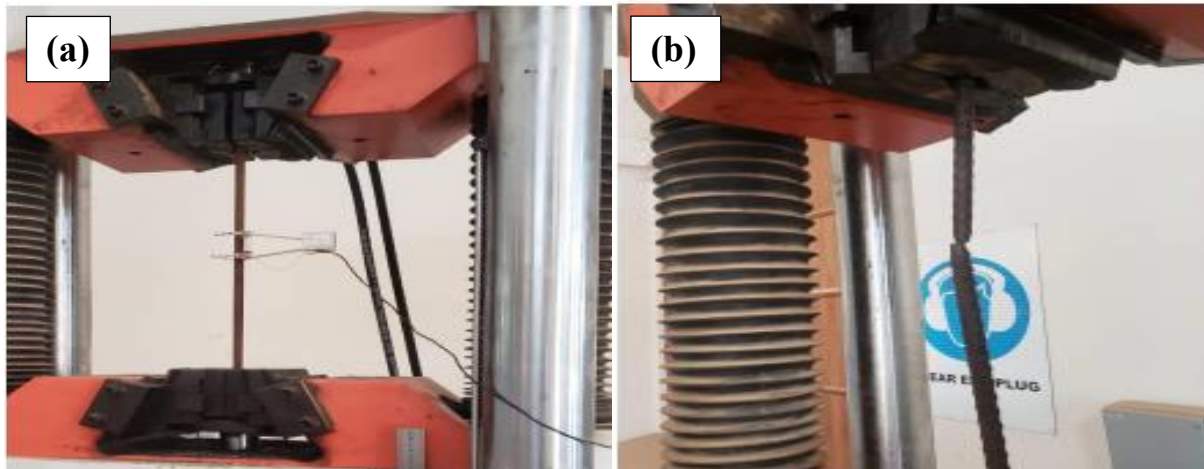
Steel rebar tensile strength test using UTM: (a) testing of specimen, (b) rupture.
